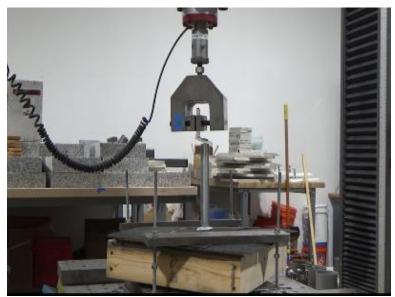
ASTM D1761 Fastener Withdrawal at Test End (typical)
